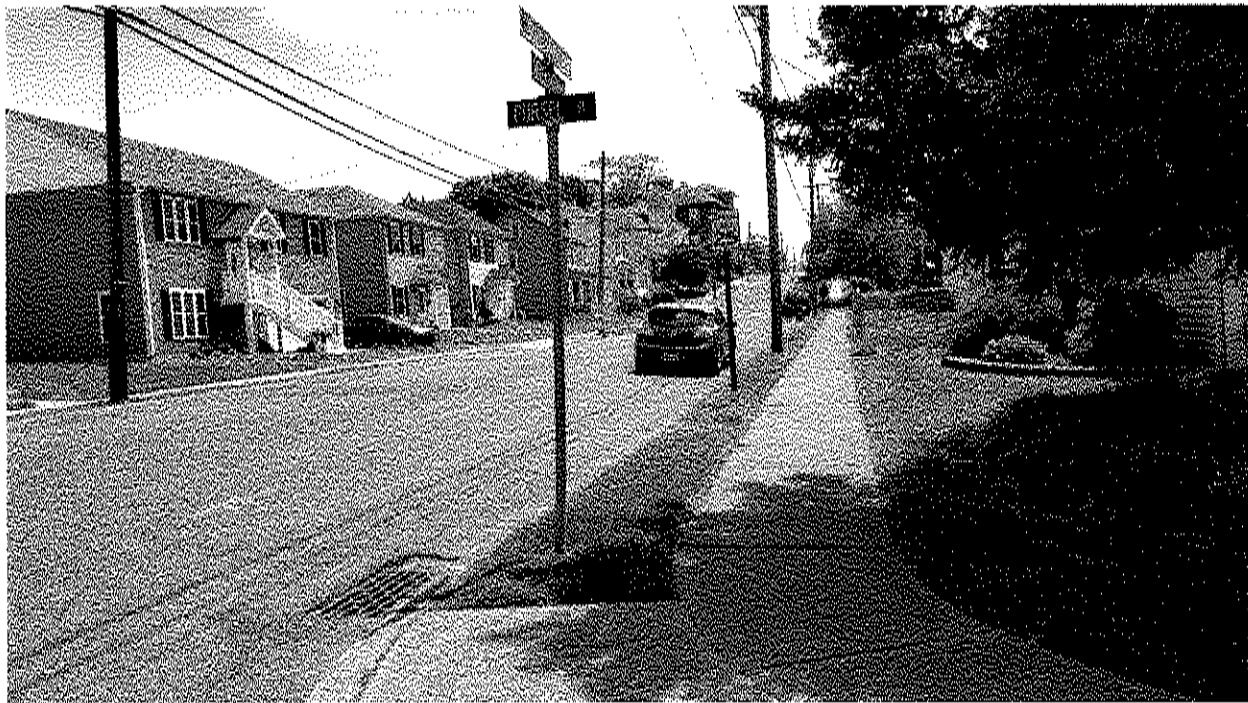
View from Pursel Street at intersection Wilbur Street looking right towards Congress Street
